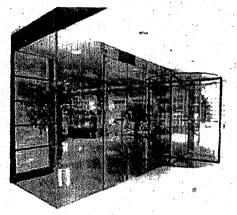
a view of a glass façade at Leman Street, London Source: www.oag.uk.com/oag_images/struct_feat5.jpg
